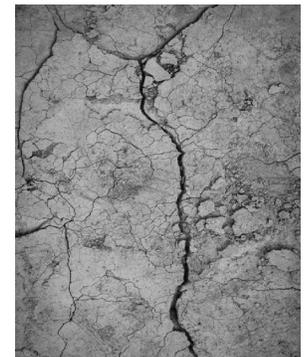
Concrete damage due to drying shrinkage (Zhang et. al., 2024).
